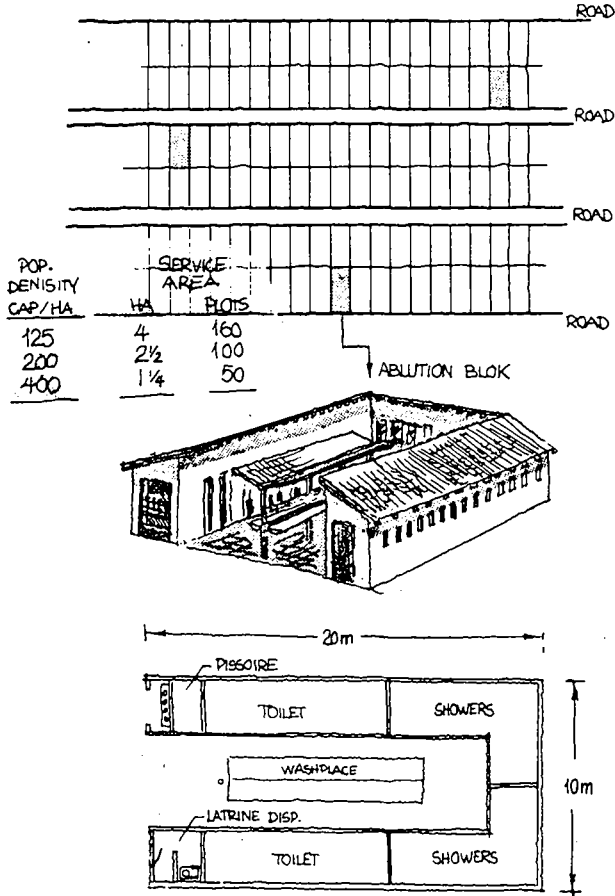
House Bucket & Ablution Block, system AB, lay-out and details
